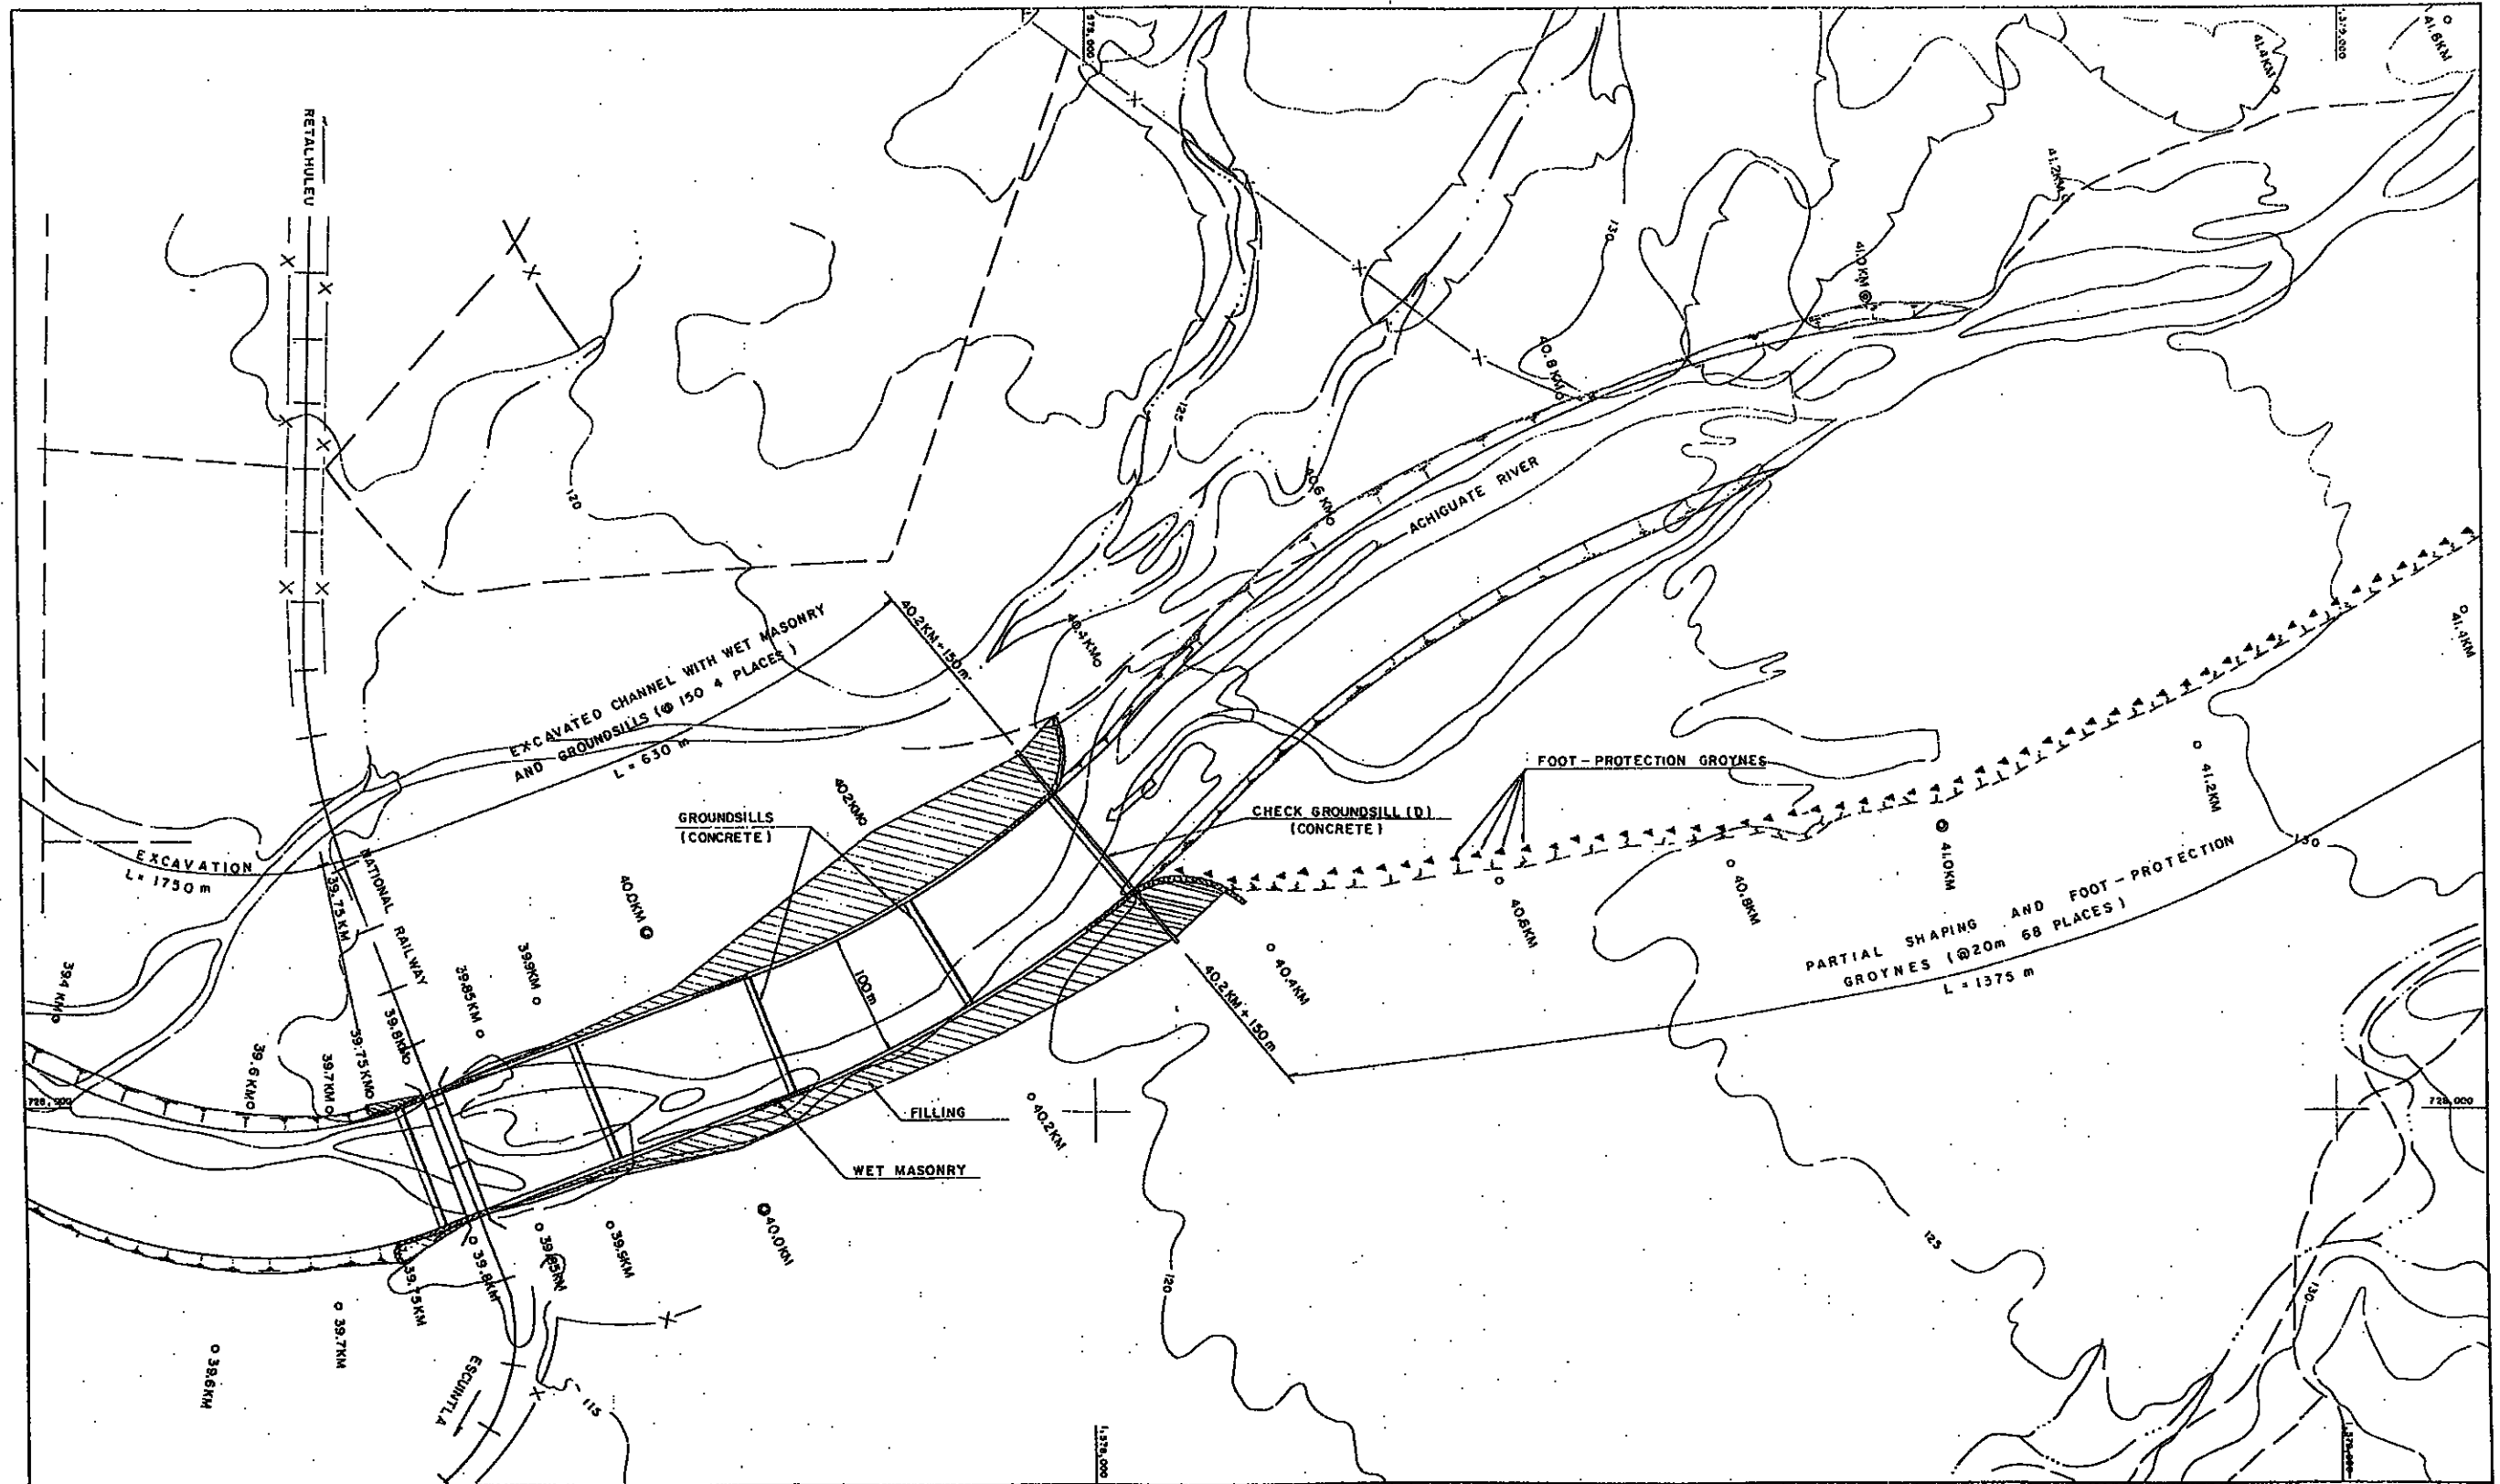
(1/6) PLAN OF RIVER IMPROVEMENT IN THE PROPOSED URGENT PLAN (ACHIGUATE RIVER)
